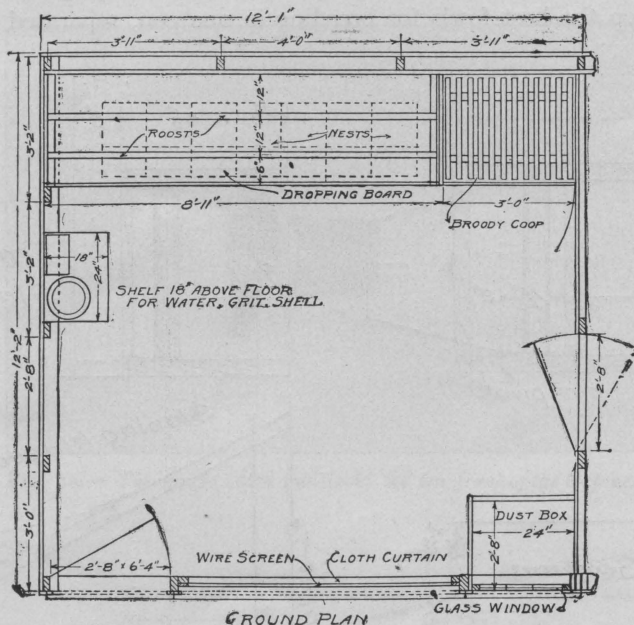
Floor plan of the Cornell poultry house with pens 12 feet square, showing size and location of the interior fixtures and timbers
